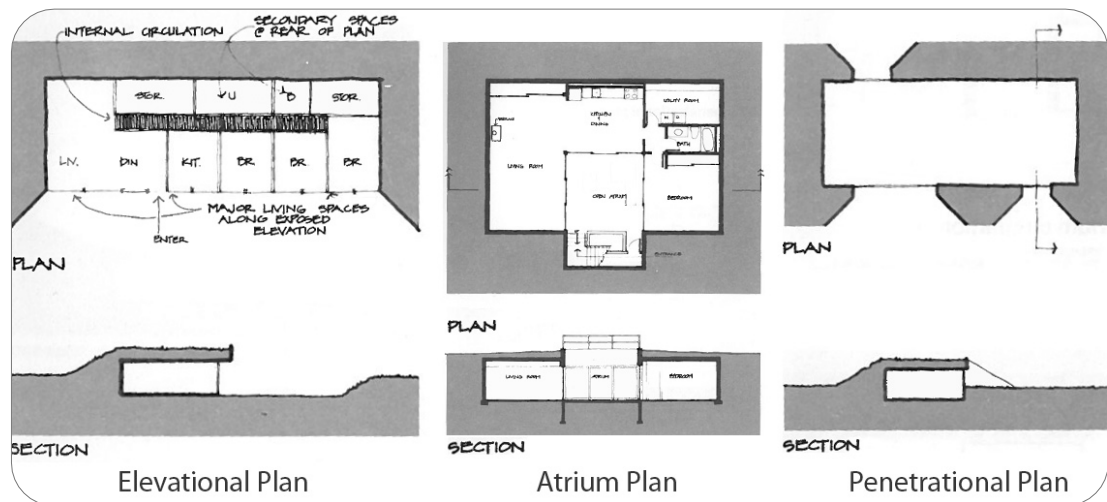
Plan concepts – elevational, atrium and penetrational. Underground Space Center, 1979
